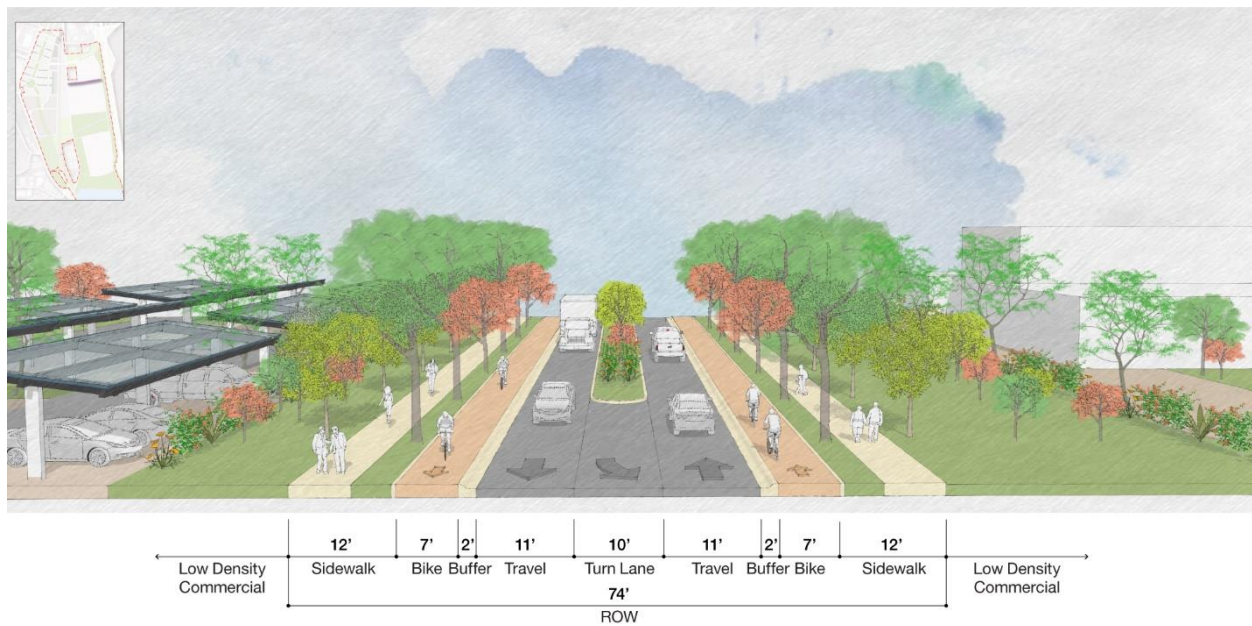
East Park Street and West Park Street Proposed Cross-Section
